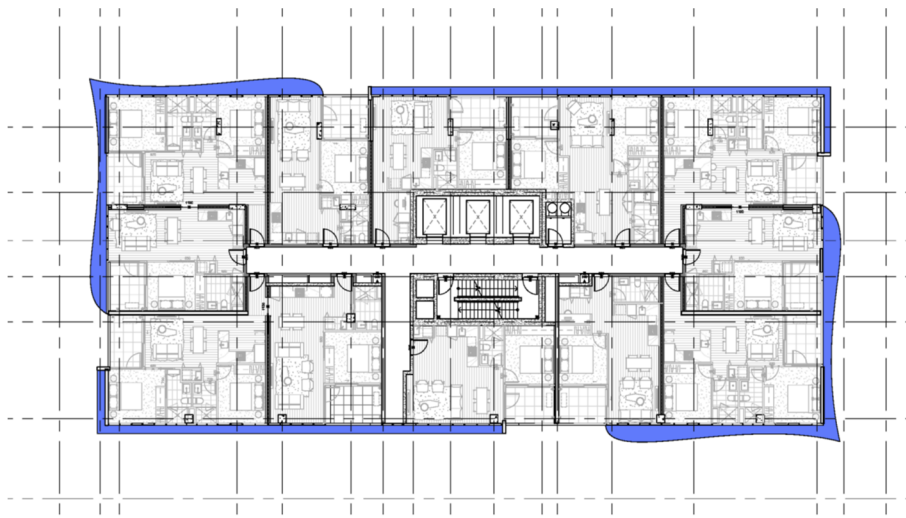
Proposed Without Prejudice Amended Plans – Levels 5-39 (dated 8 April 2020) and Façade Articulation
